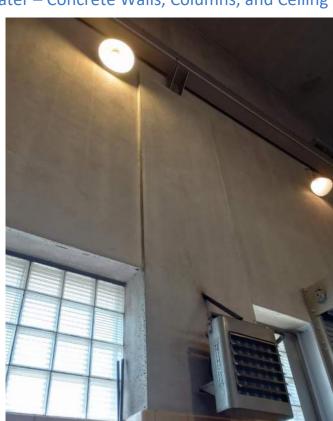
| Parkwater – Concrete Walls, Columns, and Ceiling
